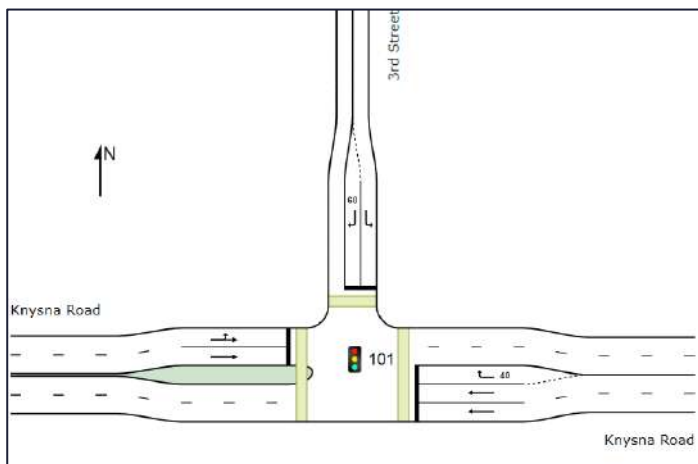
Existing Intersection Layout: Knysna Road and 3rd Street
